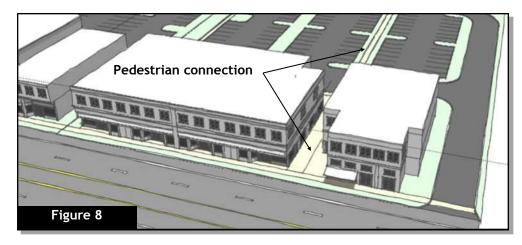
depicts a single, large property on which two structures are built, each sharing a parking area in the rear. This concept also provides a common pedestrian network and plaza space that connects each building entry with the common parking lot and the street.
